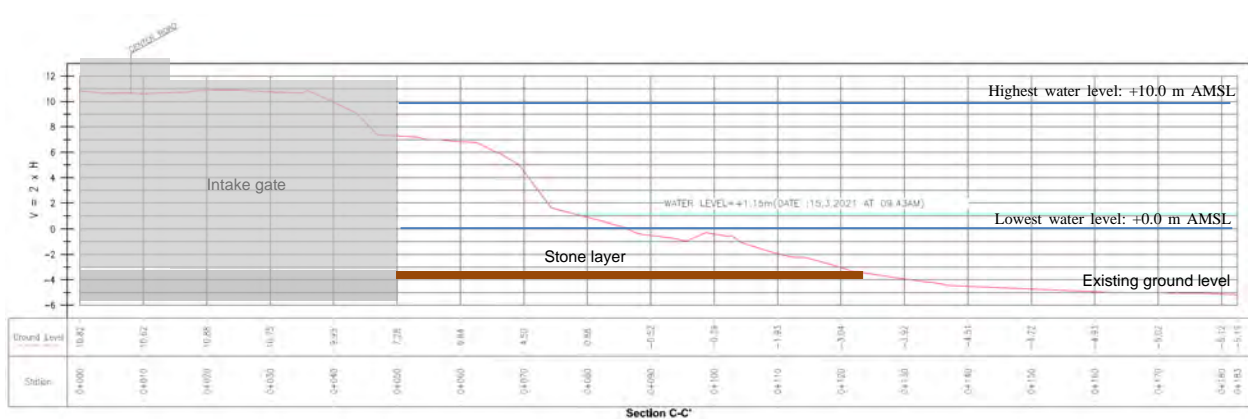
Outline Section of Proposed Protection of Revetment and Riverbed for Ta Mouk
